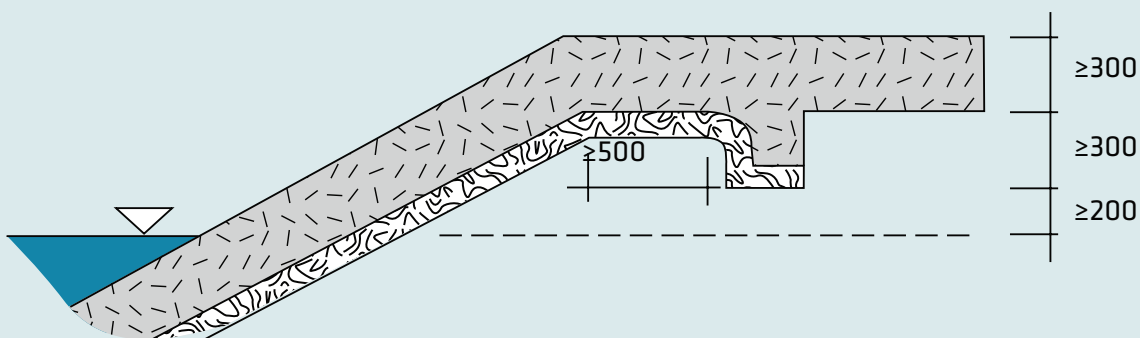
Typical anchor trench (all dimensions shown are typical values only)
